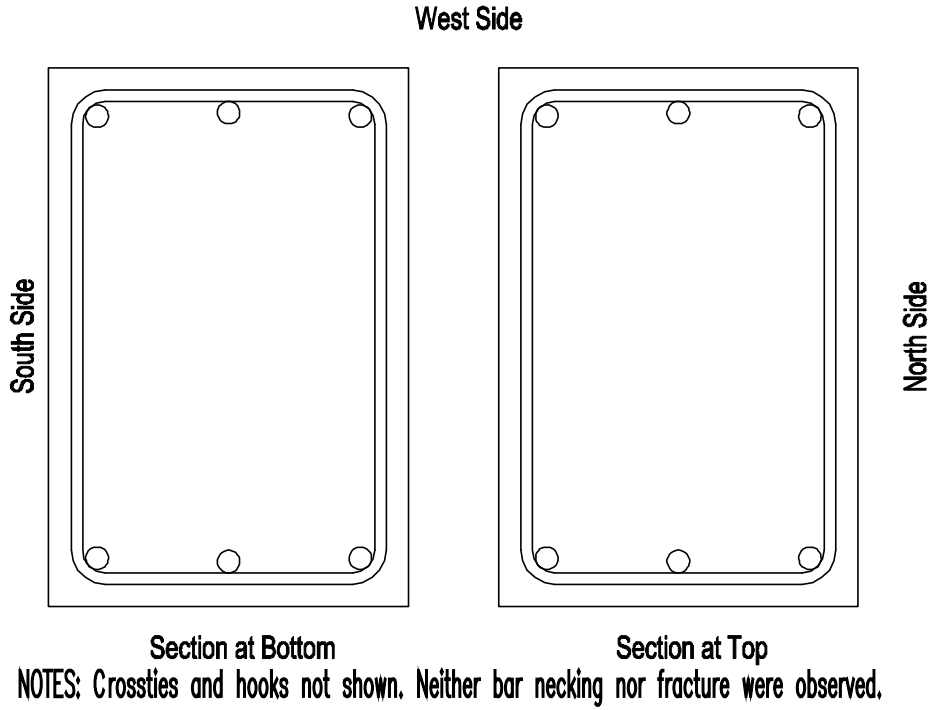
Reinforcing bar fracture locations, P80-2.5
